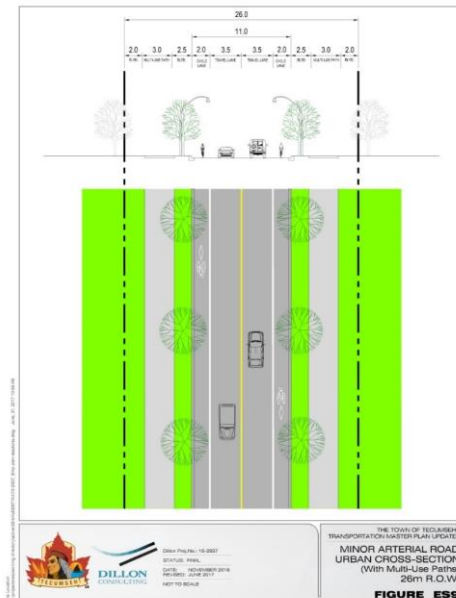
Proposed cross-section for Minor Arterial Roads (Tecumseh TMP, 2017)
